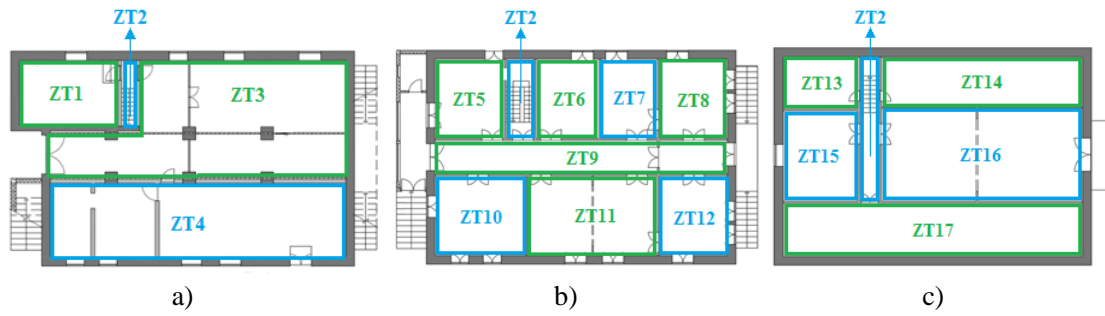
Identification of the thermal zones. a) Groundfloor plan; b) First floor plan; c) Attic plan [credits Mendes C., 2015]
